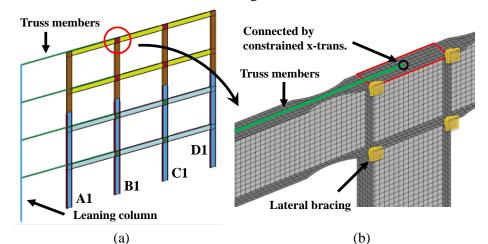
Finite element model of (a) the four-story SMF; and (b) beam-to-column connections [4]
